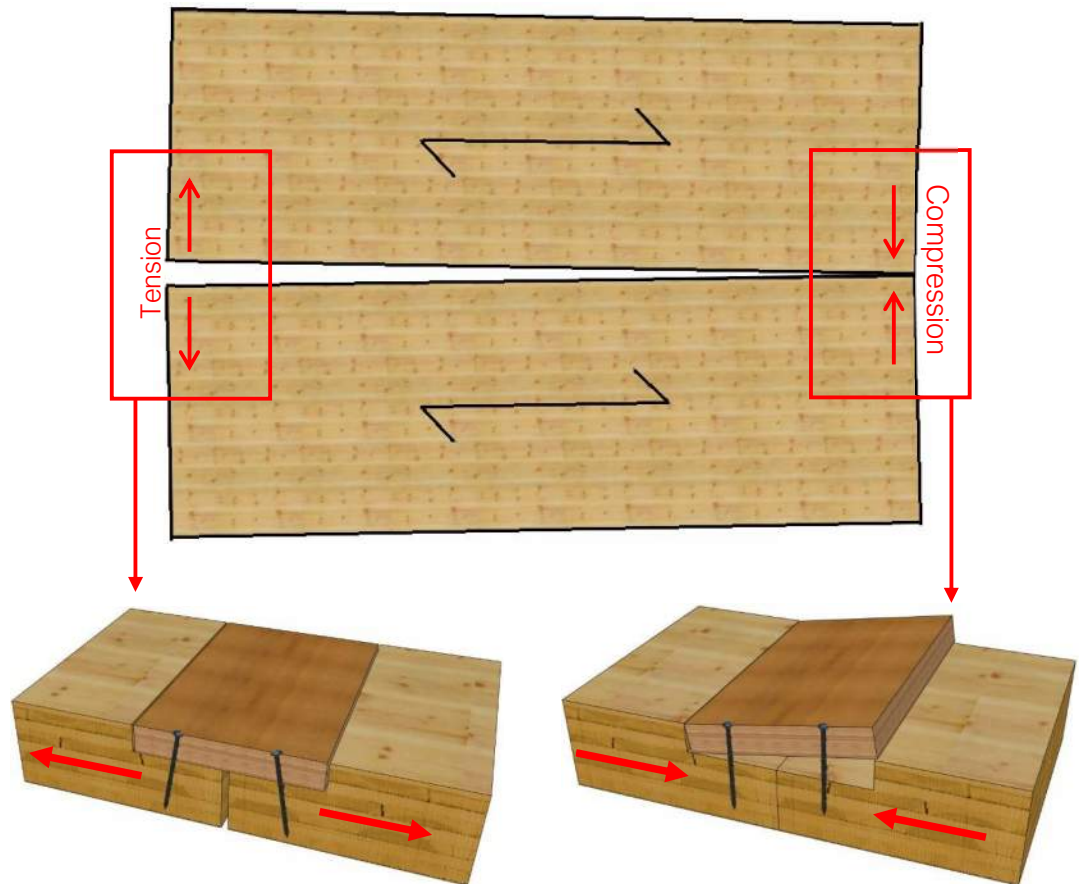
Potential behaviour of spline joint connections in a CLT floor diaphragm under high loads.
